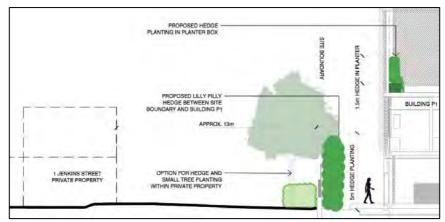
| Landscape section showing proposed landscaping within and surrounding perimeter of Building P1 (Source: RtS 2020)
